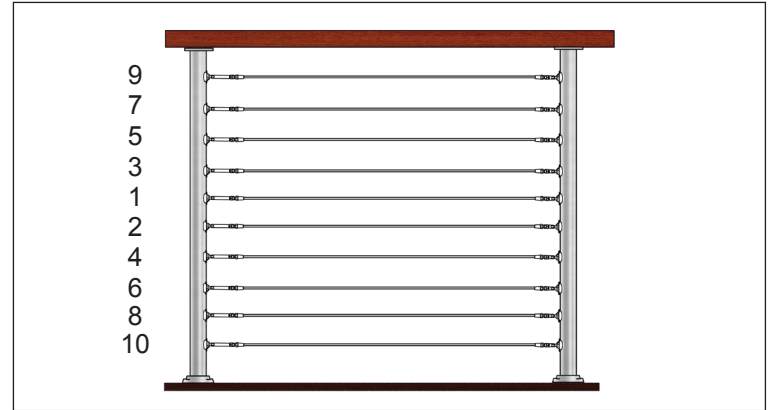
Figure H. Tensioning Diagram - Begin with the center run of cable and alternate working above and below until cables are tight.
